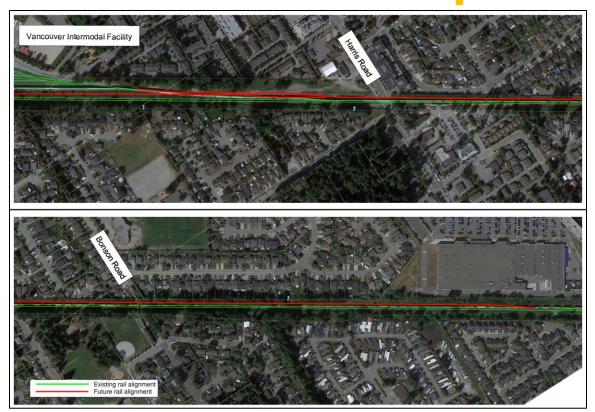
Existing and Future (with Project) Rail Alignments near Harris Road
